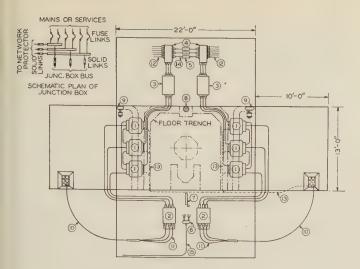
Schematic arrangement of the floor and four walls of a standard 11-kv. underground vault
